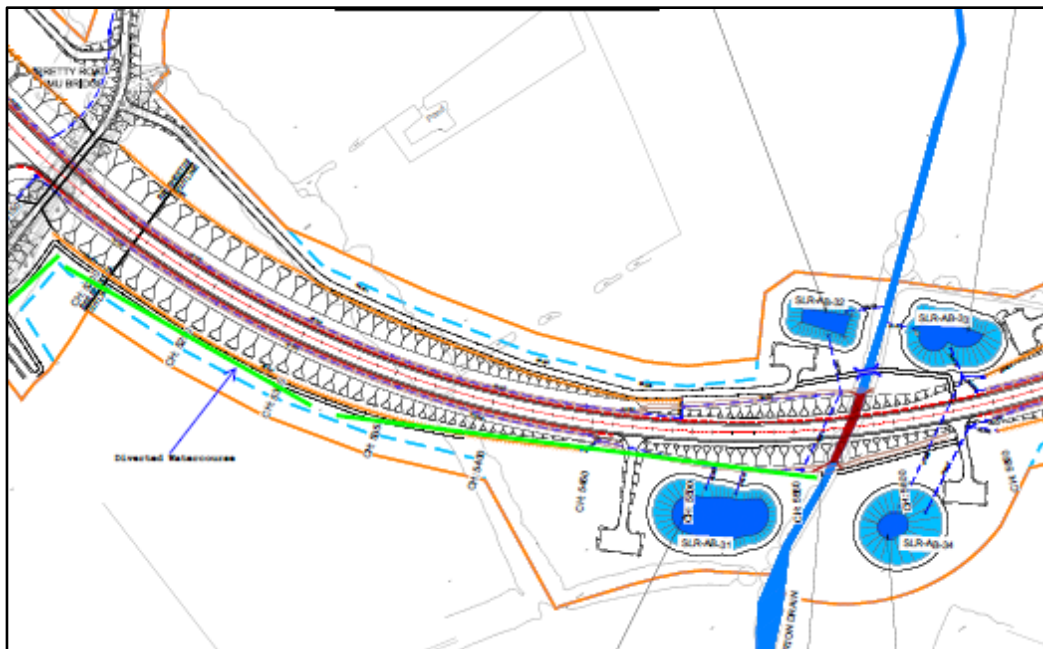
Pretty Road Drain Watercourse Diversion West to Pretty Road Drain
